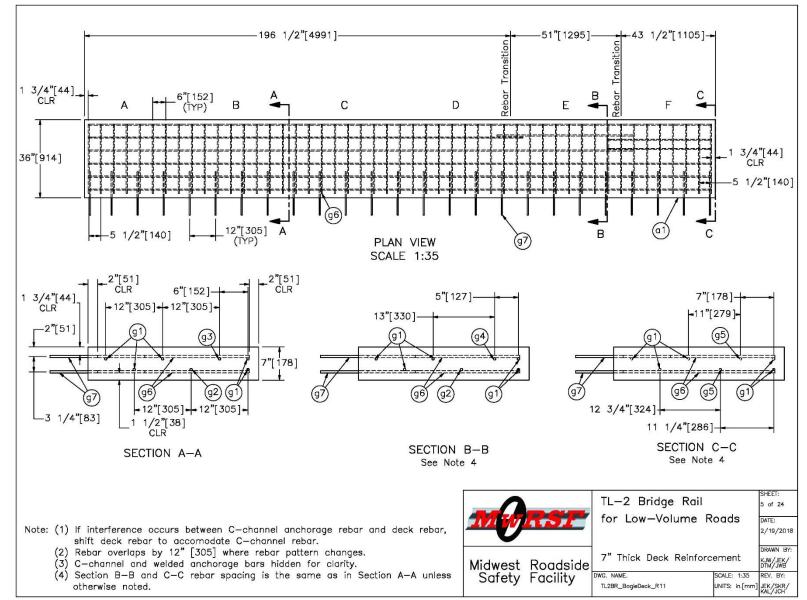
Bogie Testing Matrix and Setup, 7-in. Thick Deck Reinforcement
